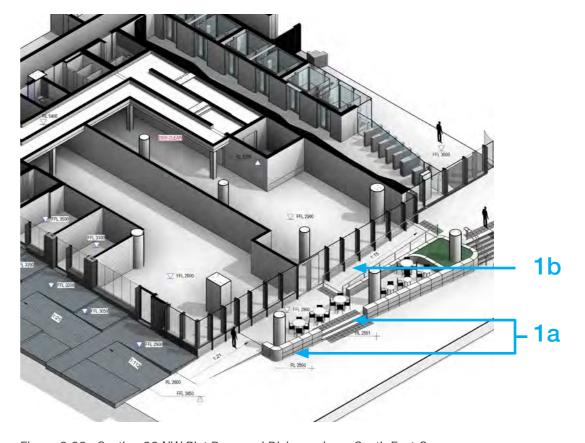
Section 96 NW Plot Proposed Dicksons Lane South East Corner
